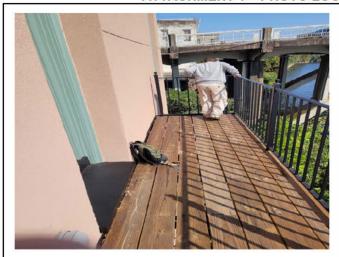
First Level, room on south W1-1 side of building 1018 Water Ave
